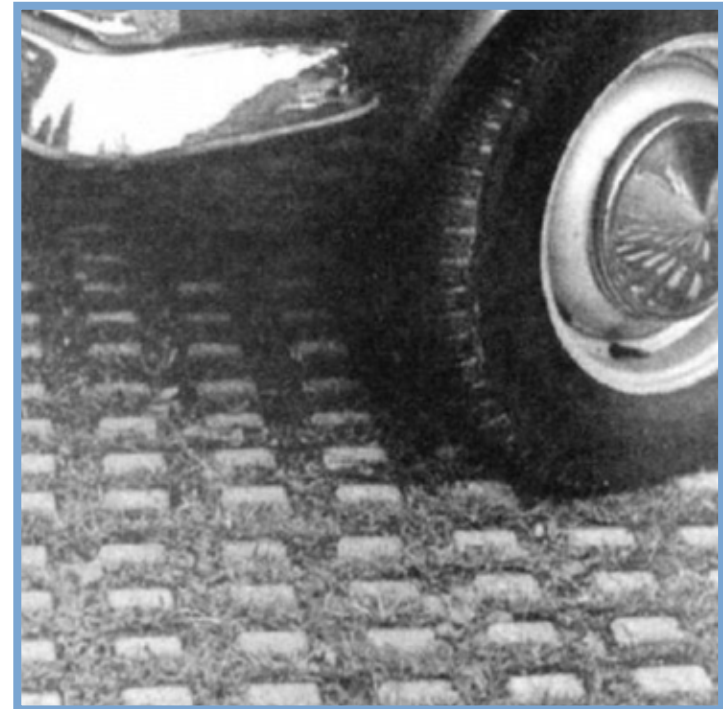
Example of a concrete grid pavement used in an overflow parking area (ODNR 1992).
